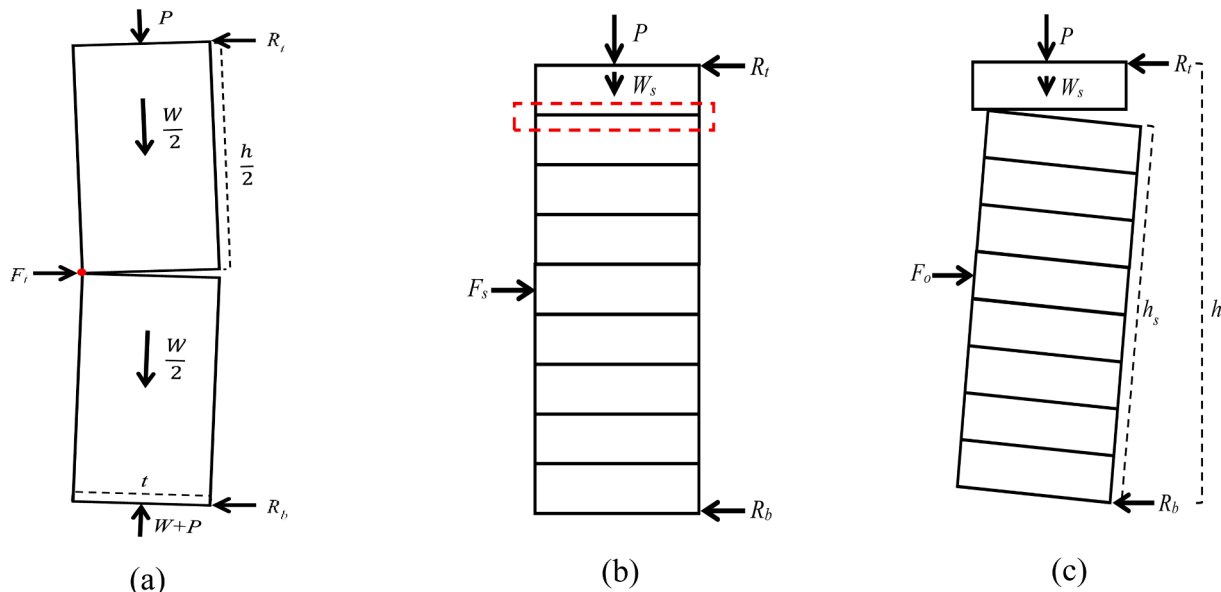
Possible out-of-plane failure modes in tyre walls: (a) Flexural instability; (b) Sliding instability; (c) Overturning instability.
